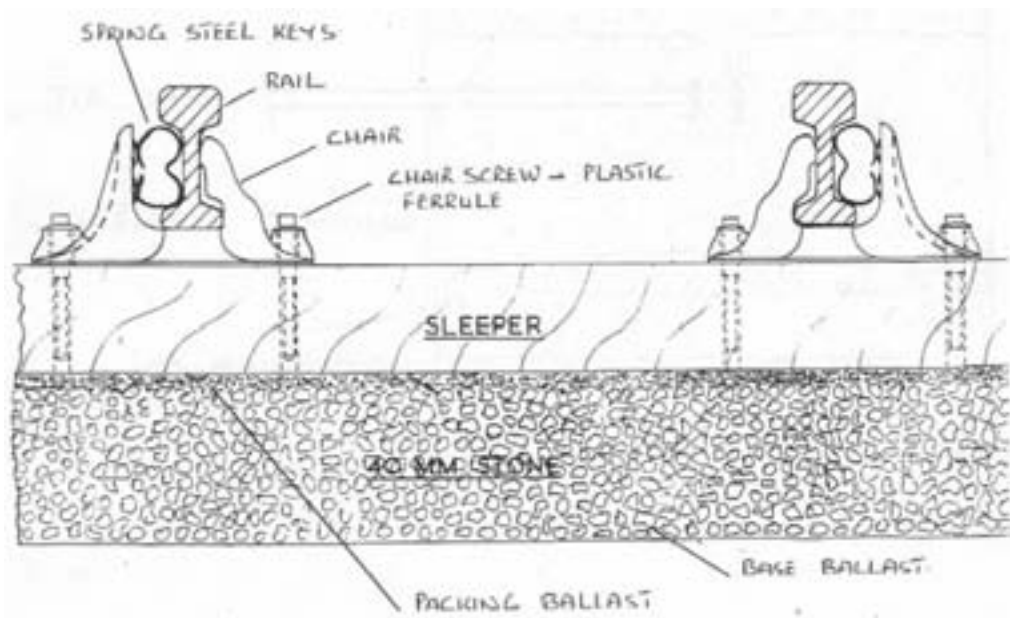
Schematic diagram illustrating Blackpool and Fleetwood tramway bull head rail track construction
